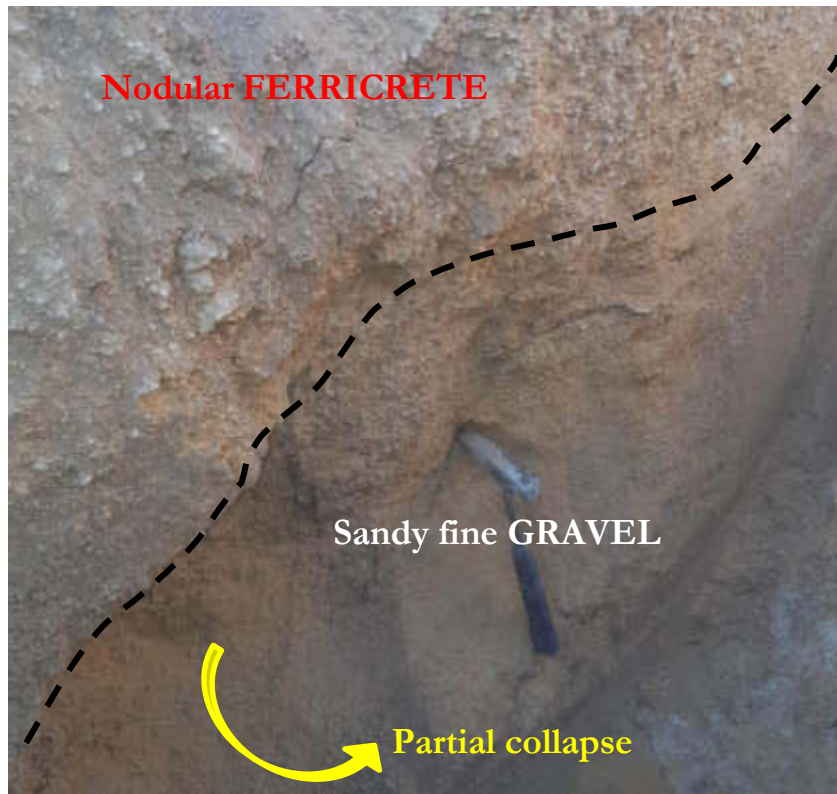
TP14 – Partial collapse of trial pit sidewall within the pinholed sandy fine gravel horizon; prior to water level rise.
